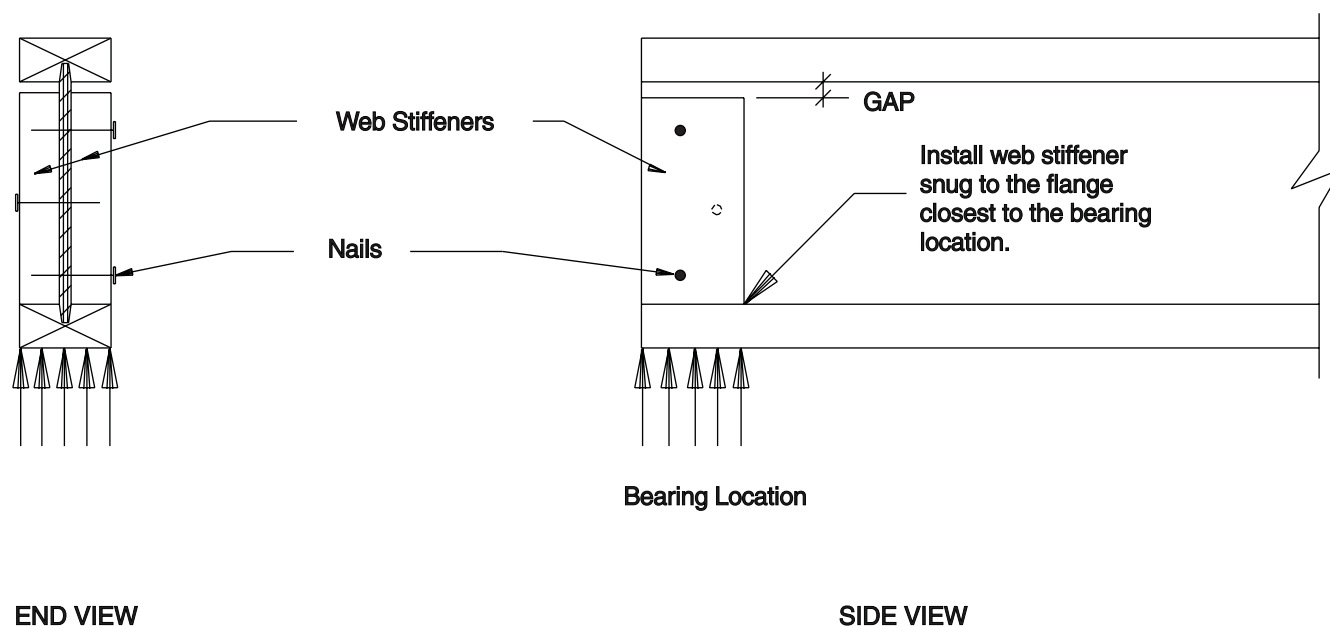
End Bearing Web Stiffeners (Bearing Block)
